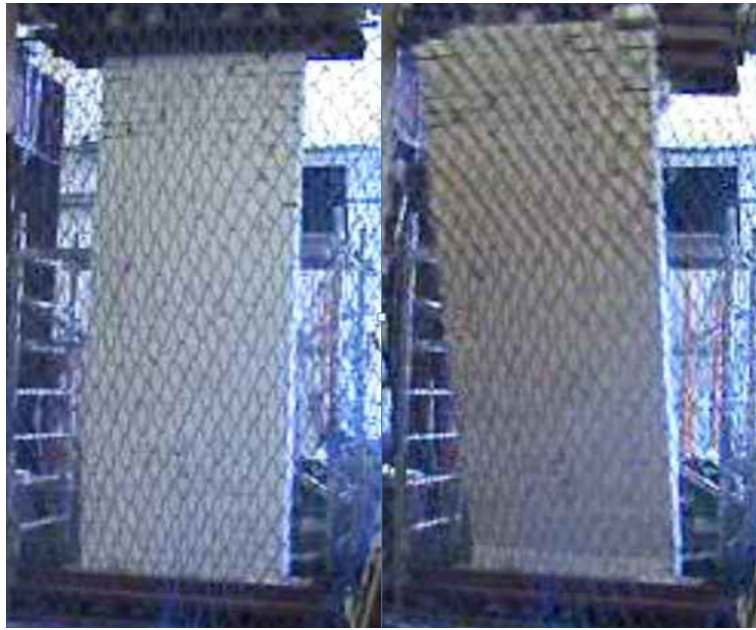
122 Wall W#4 at the beginning of the test (left) and failing (right)
